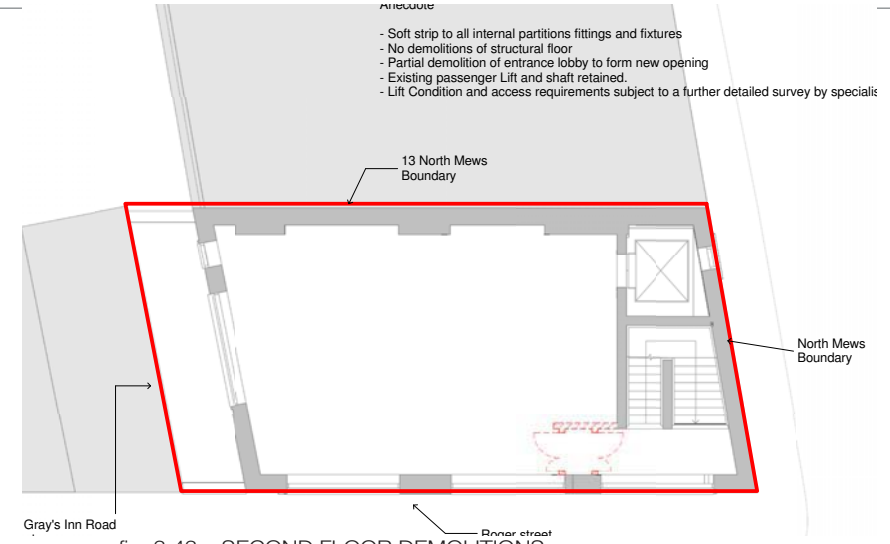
SECOND FLOOR DEMOLITIONS
